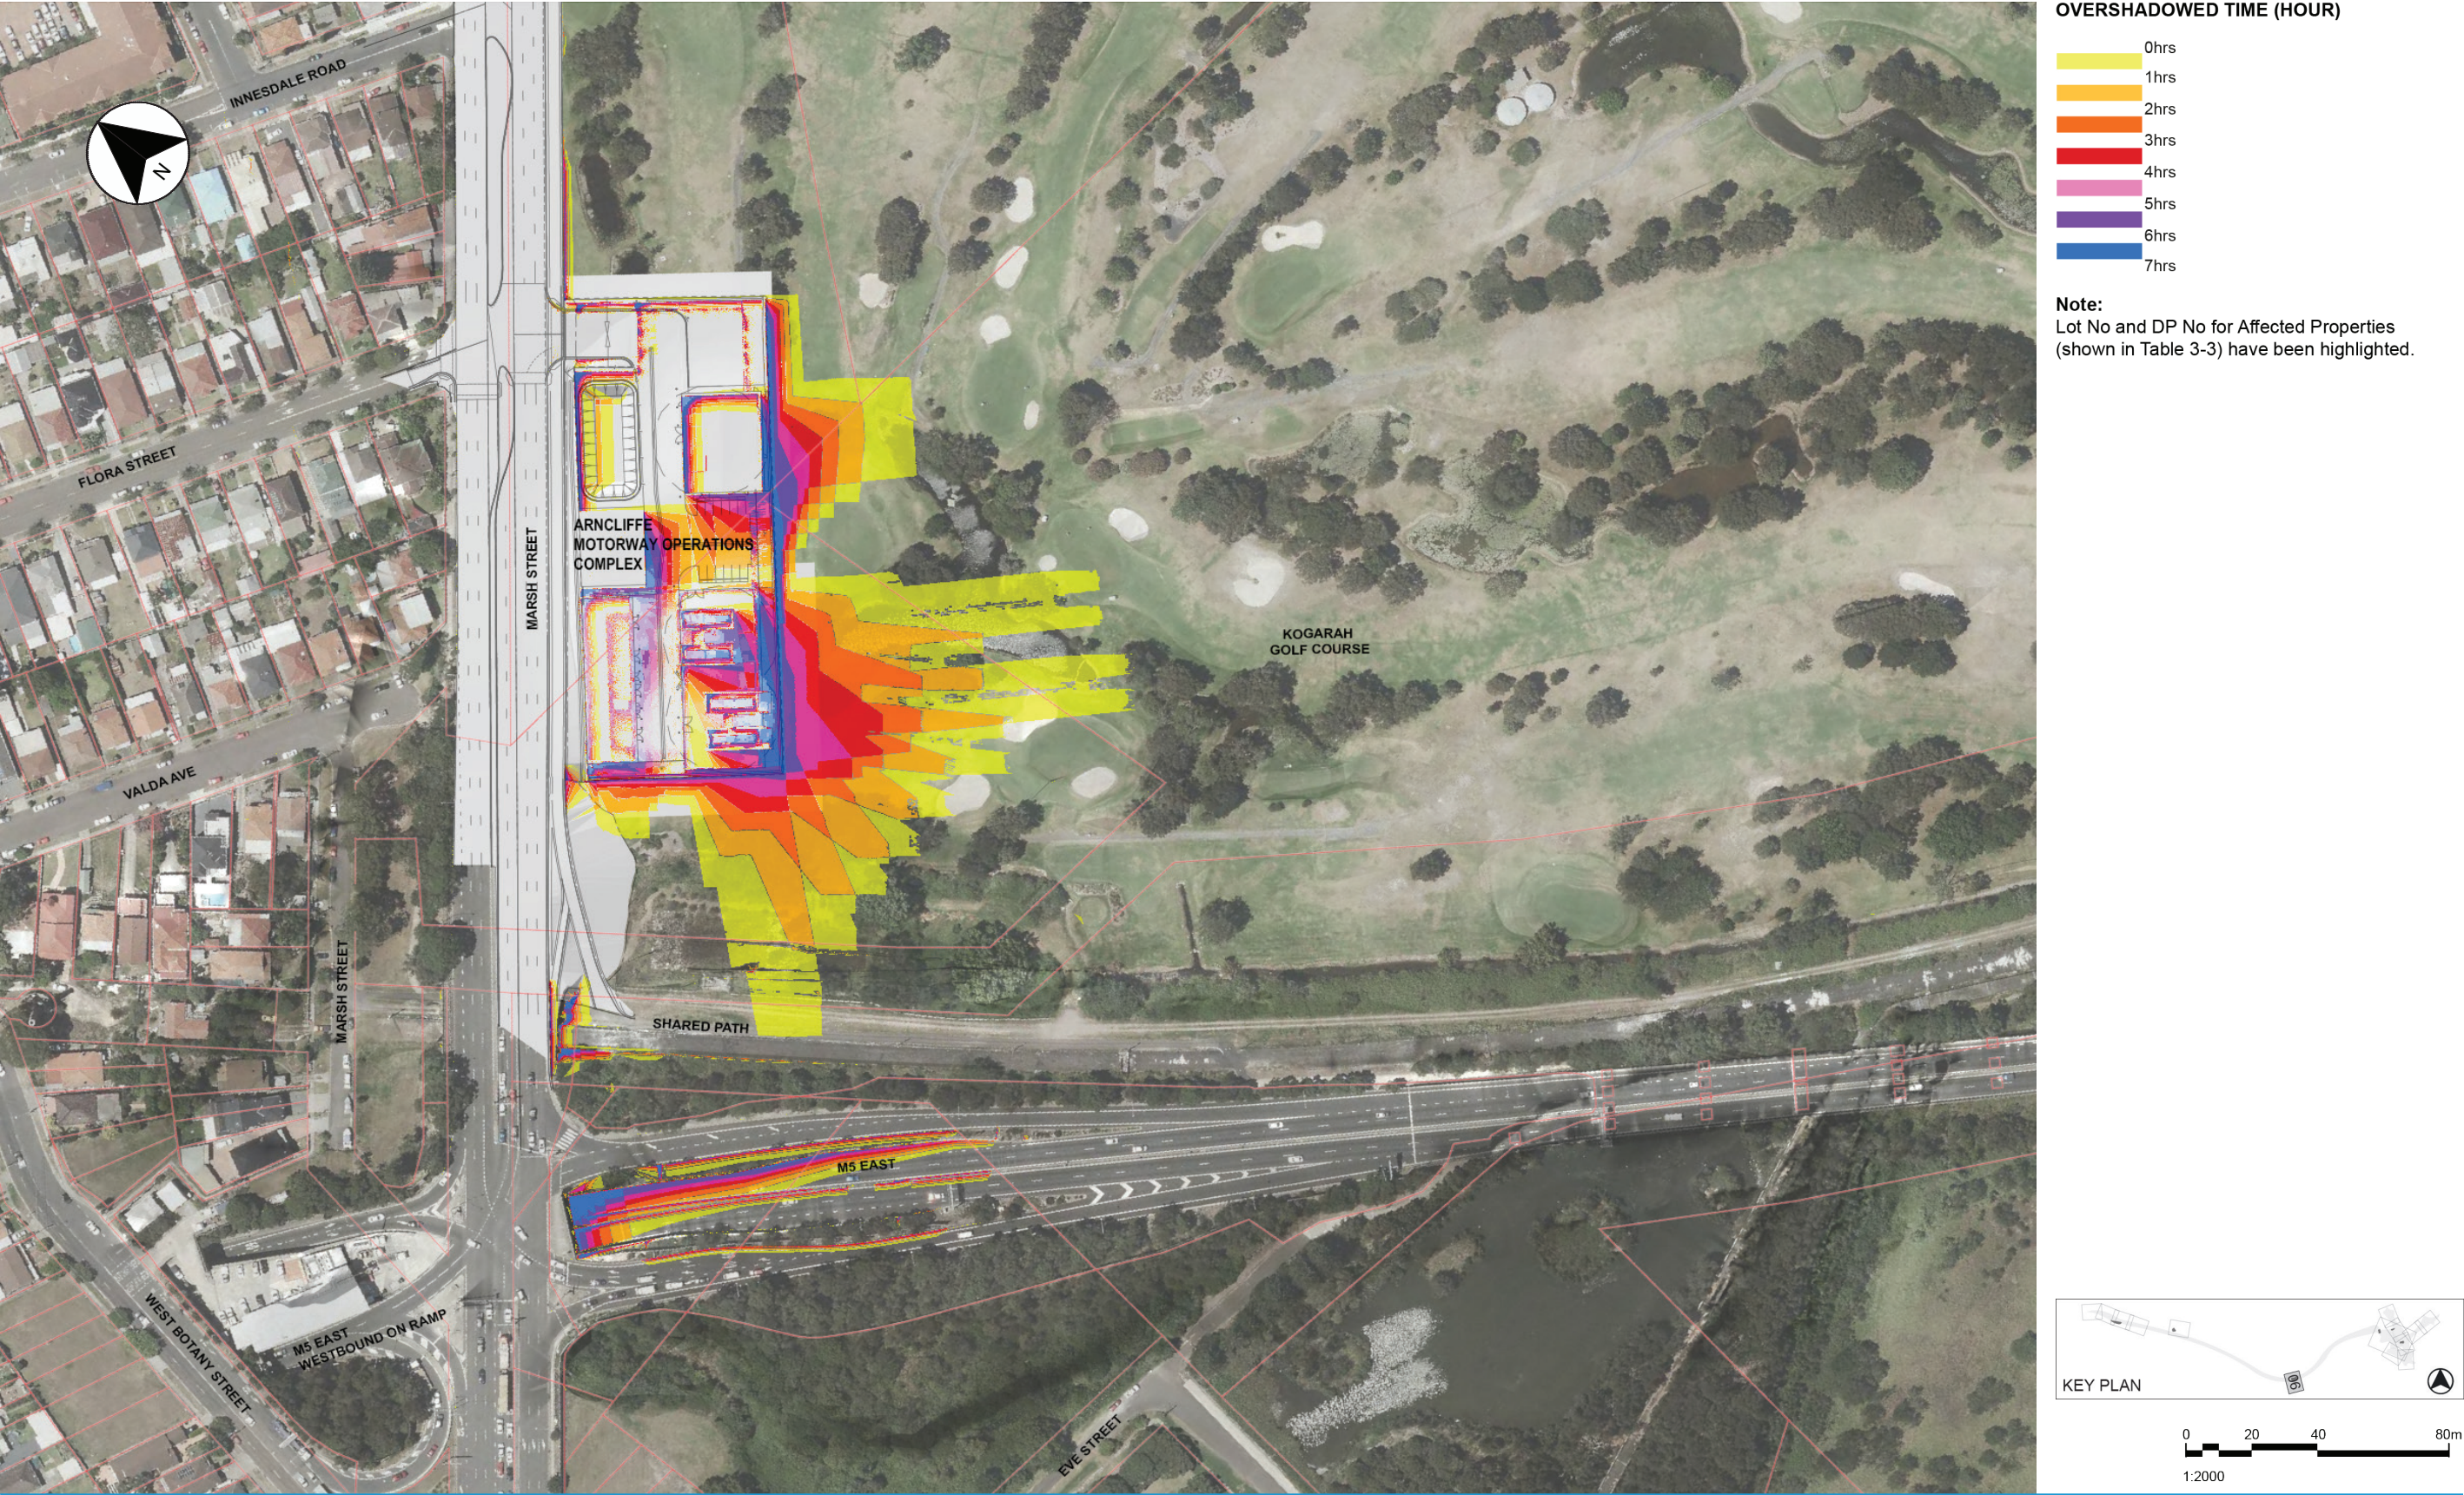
Overshadowing Assessment Plan - Sheet 6 of 14 - 1:2000
